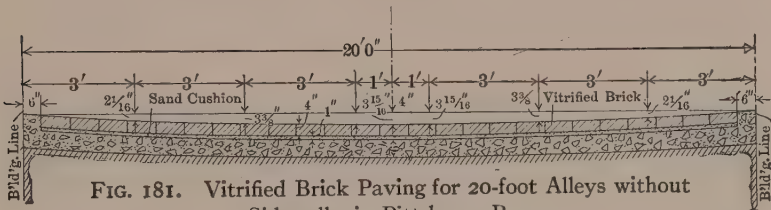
Vitrified Brick Paving for 20-foot Alleys without Sidewalks in Pittsburg, Pa.
